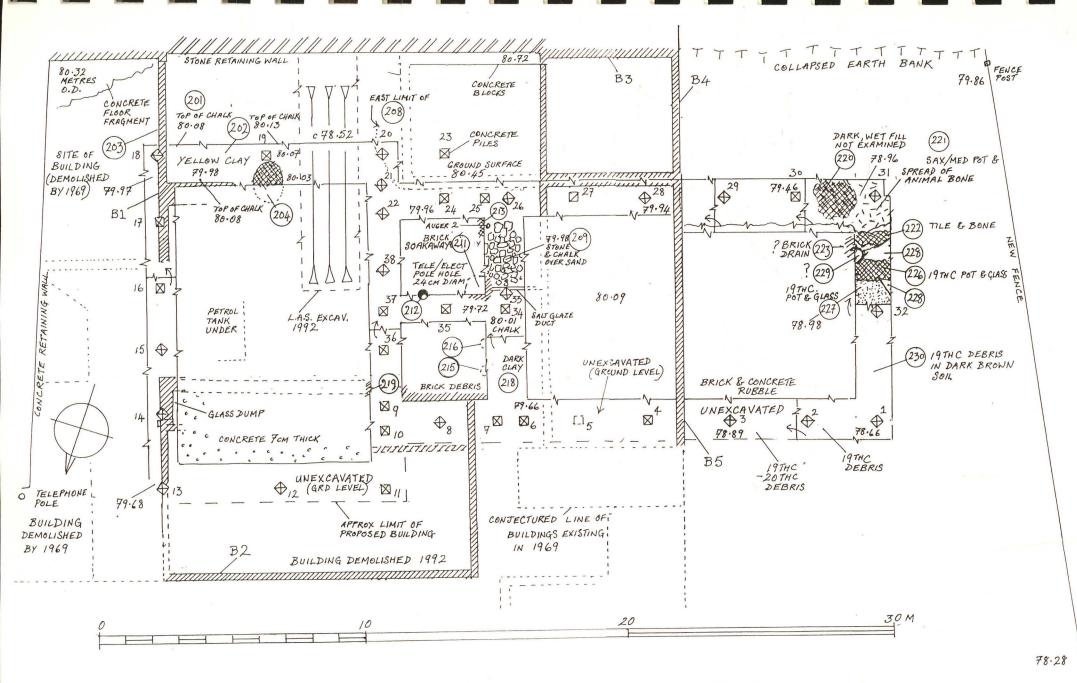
Plan of trench and piles for new science block showing earlier footings and exposed features.
